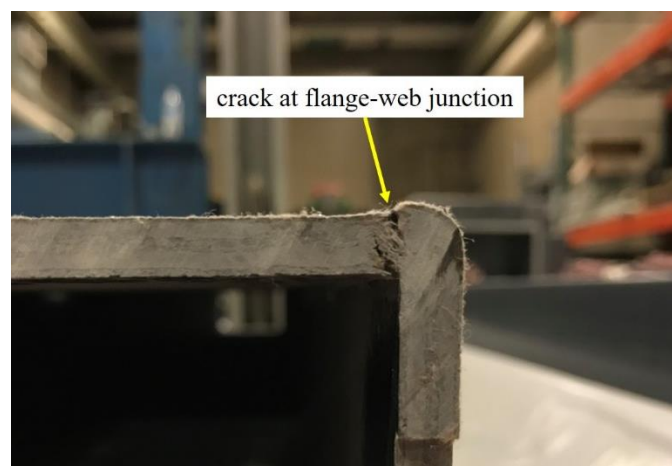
Crack at the flange-web junction occurred in test B1-F1-700
